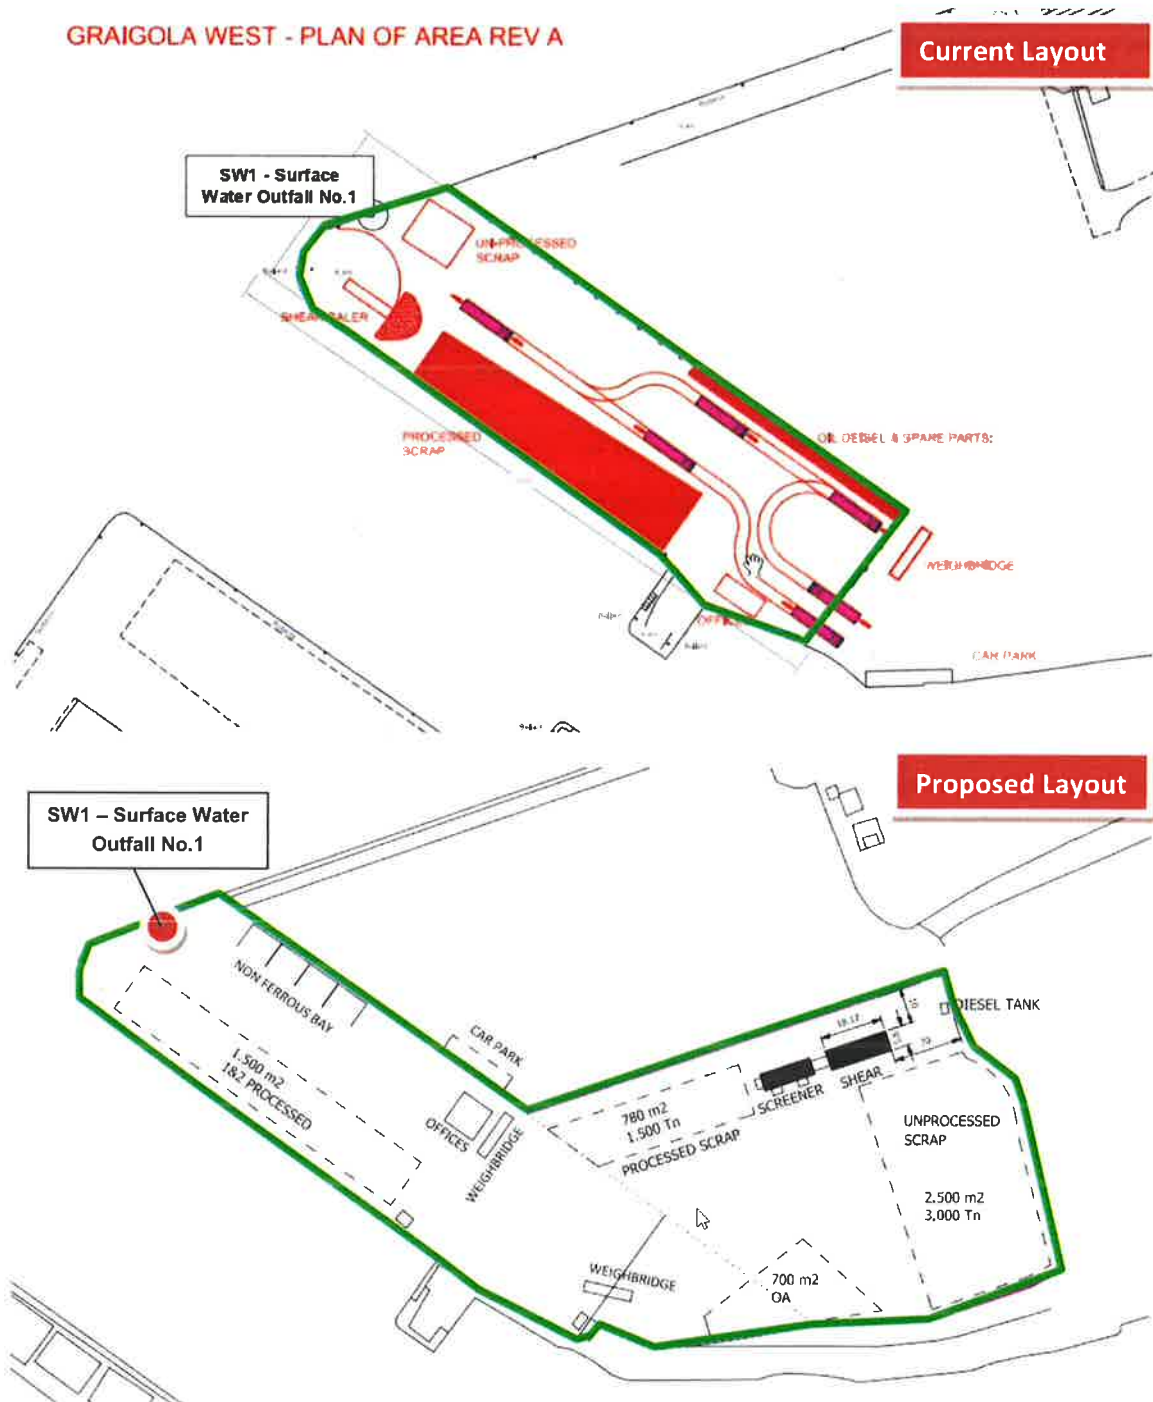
Current and proposed site layouts (permit boundary in green)
